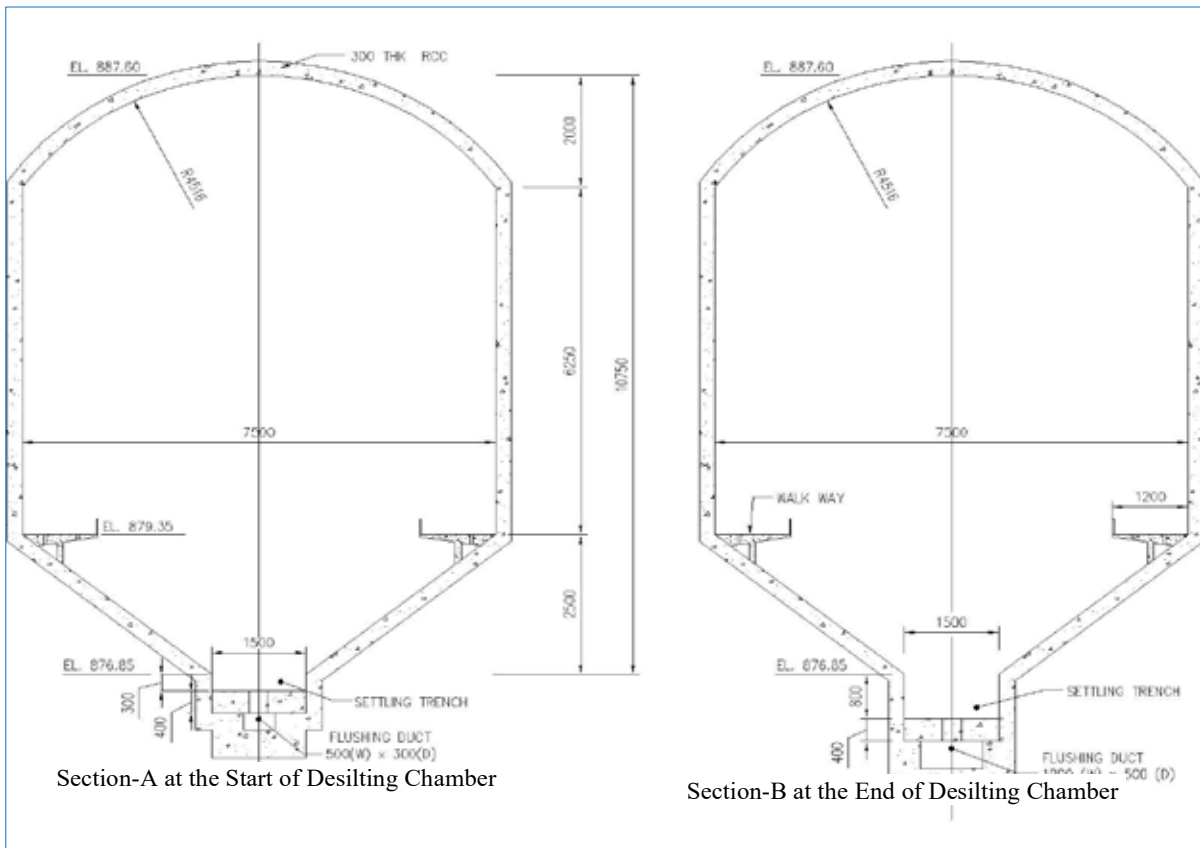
Cross Section of Desilting Chamber with Settling Trench & Flushing Duct
